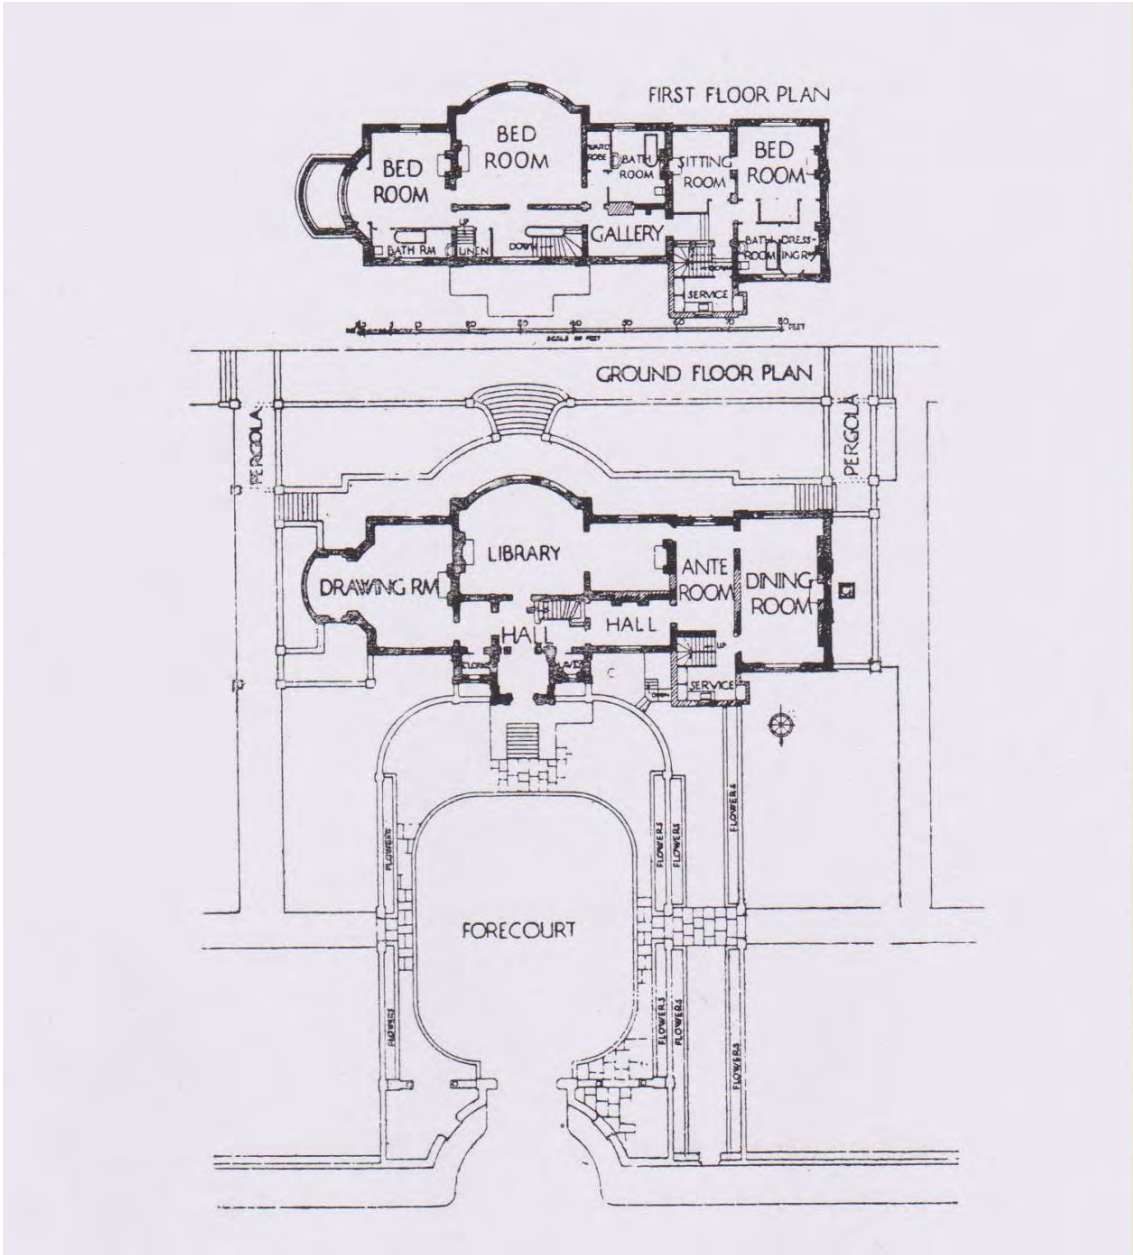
Plans of Beach House. as altered in 1917, with the new forecourt
